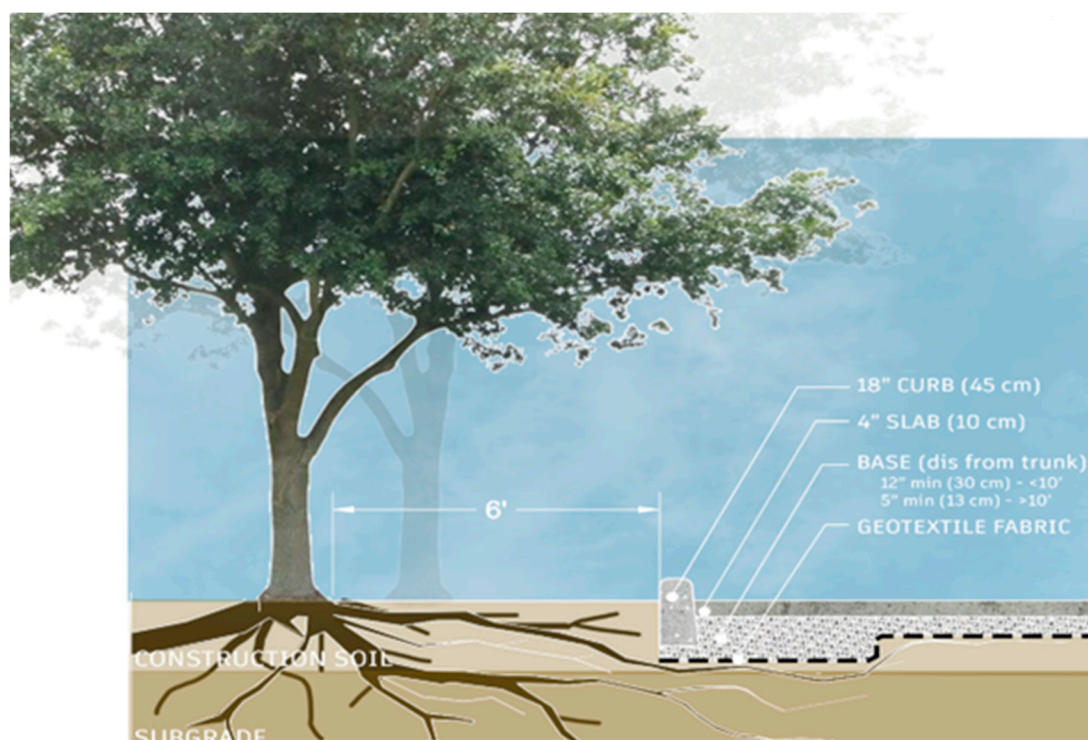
Design schematic of root-soil-pavement system for in close proximity (1.8 m).
